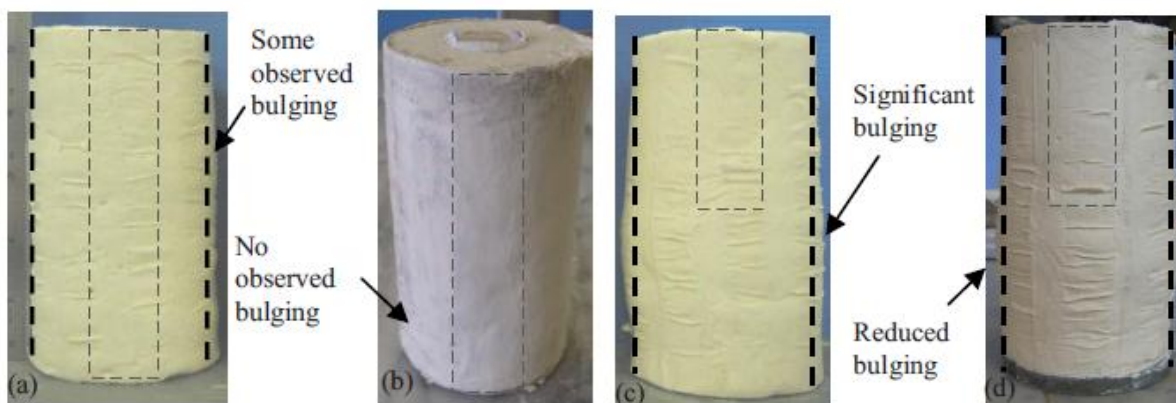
Modes of failure of clay specimens with (a) fully penetrating unreinforced column; (b) fully penetrating reinforced column; (c) unreinforced column with penetration ratio of 0.5; and (d) reinforced column with penetration ratio of 0.5
